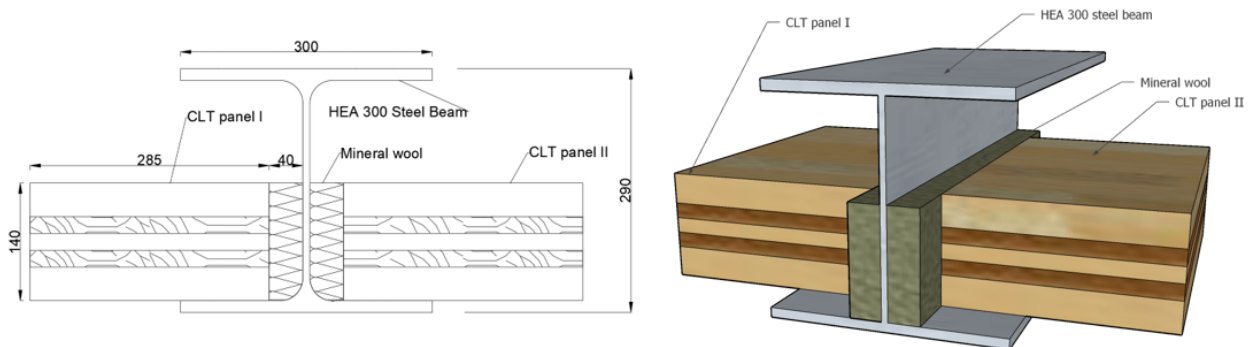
The assembled test sample: Front view (left) and 3D illustration (right)
